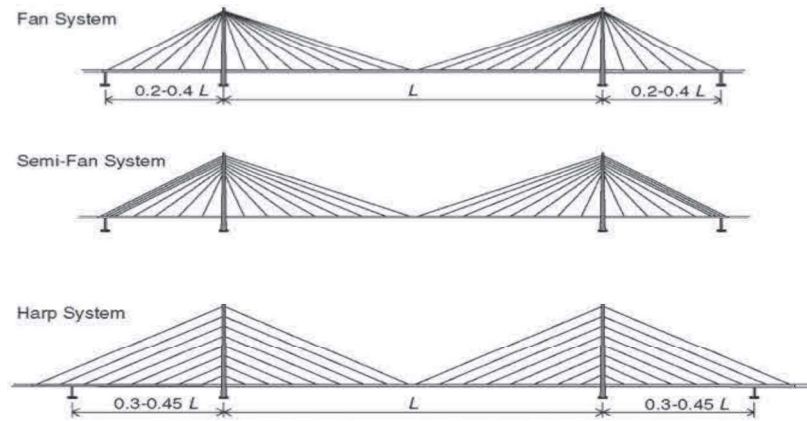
Cable system configurations of cable-stayed bridges [3]
